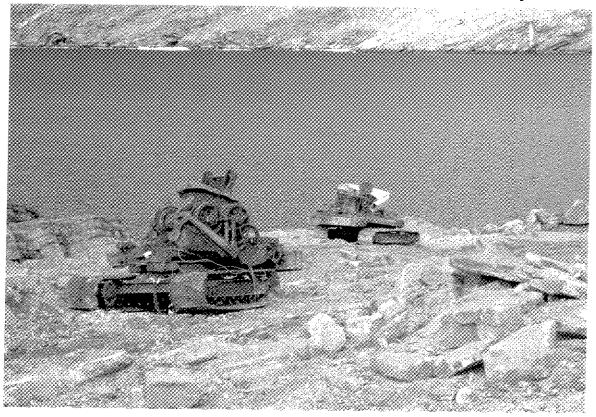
Excavating Metal Contaminated Soils at the Beach Dump
